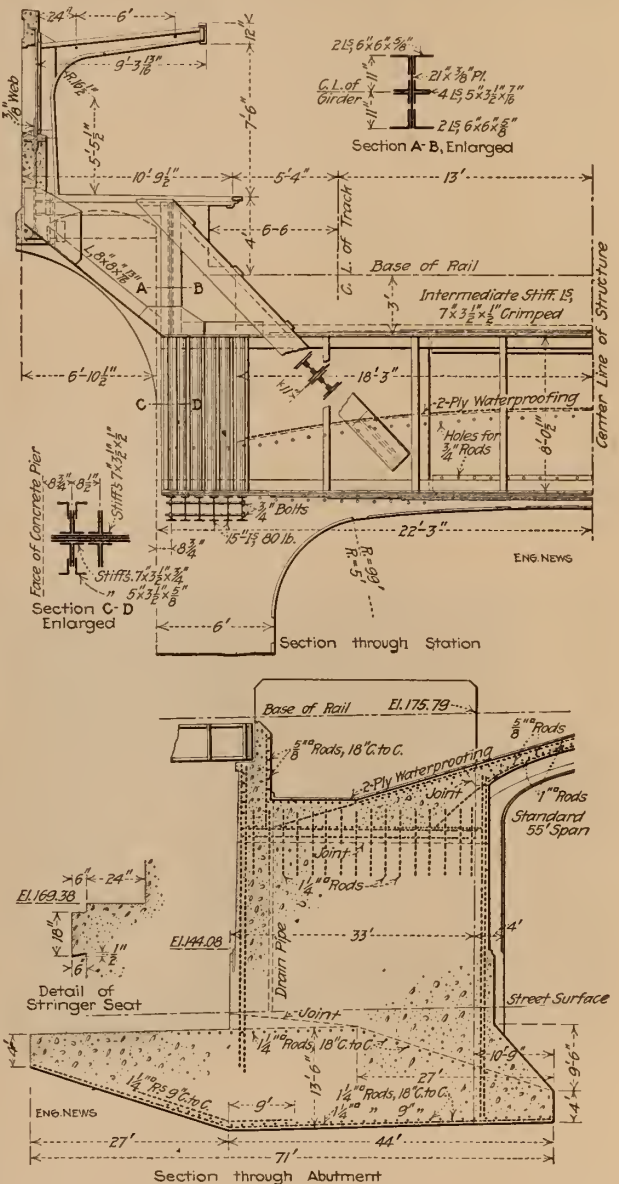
SECTION THROUGH STATION AND DETAILS OF ABUTMENT, QUEENS BOULEVARD VIADUCT
